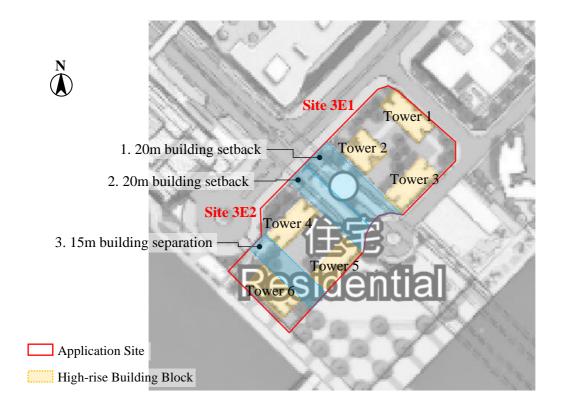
Layout plan of Sites 3E1 and 3E2 of Baseline Scheme
